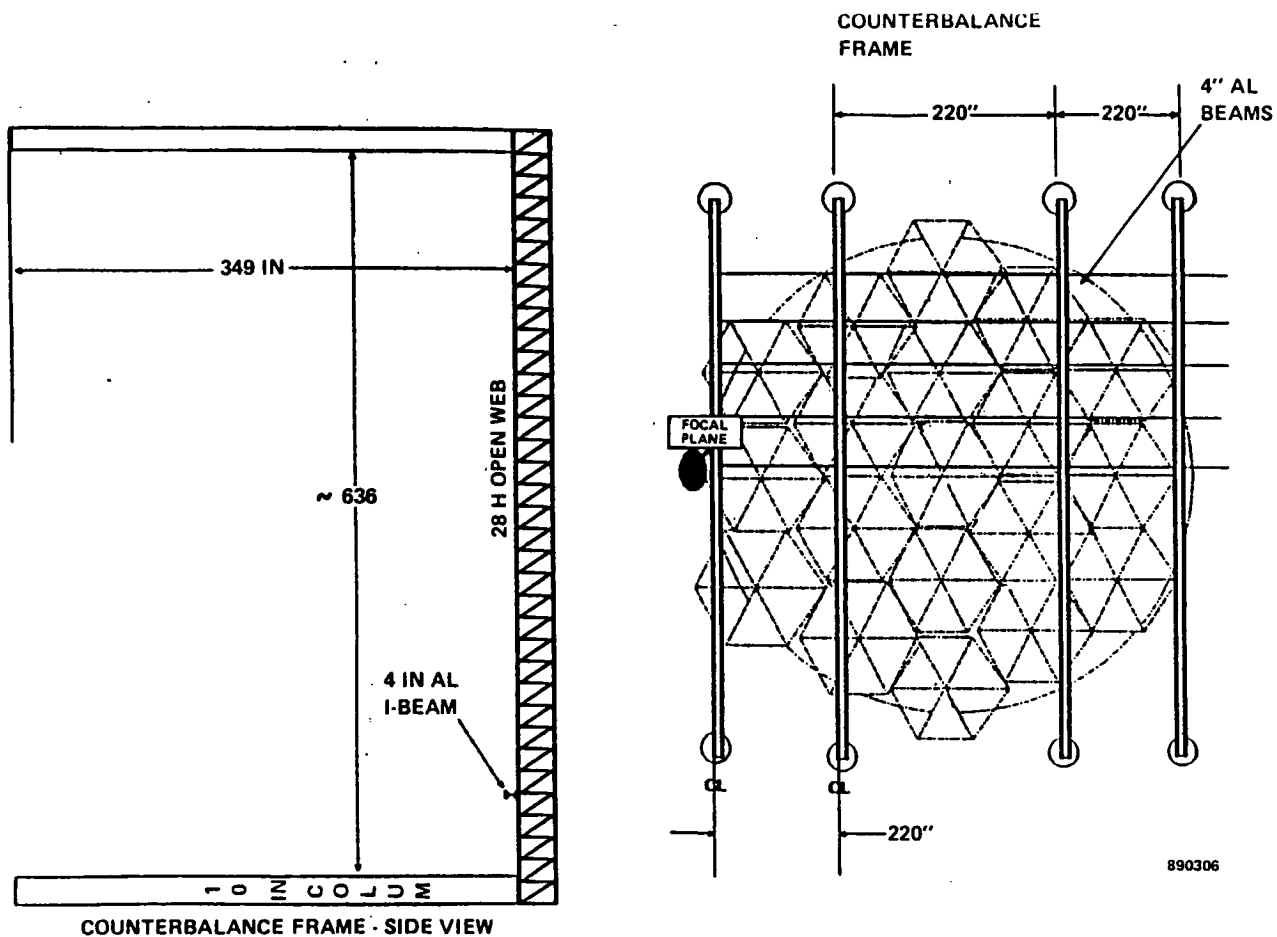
Schematic Of The Counterbalance Structure Comprised Of Four Standard Roof Trusses That Are Supported By Eight 10 Inch Diameter Columns
